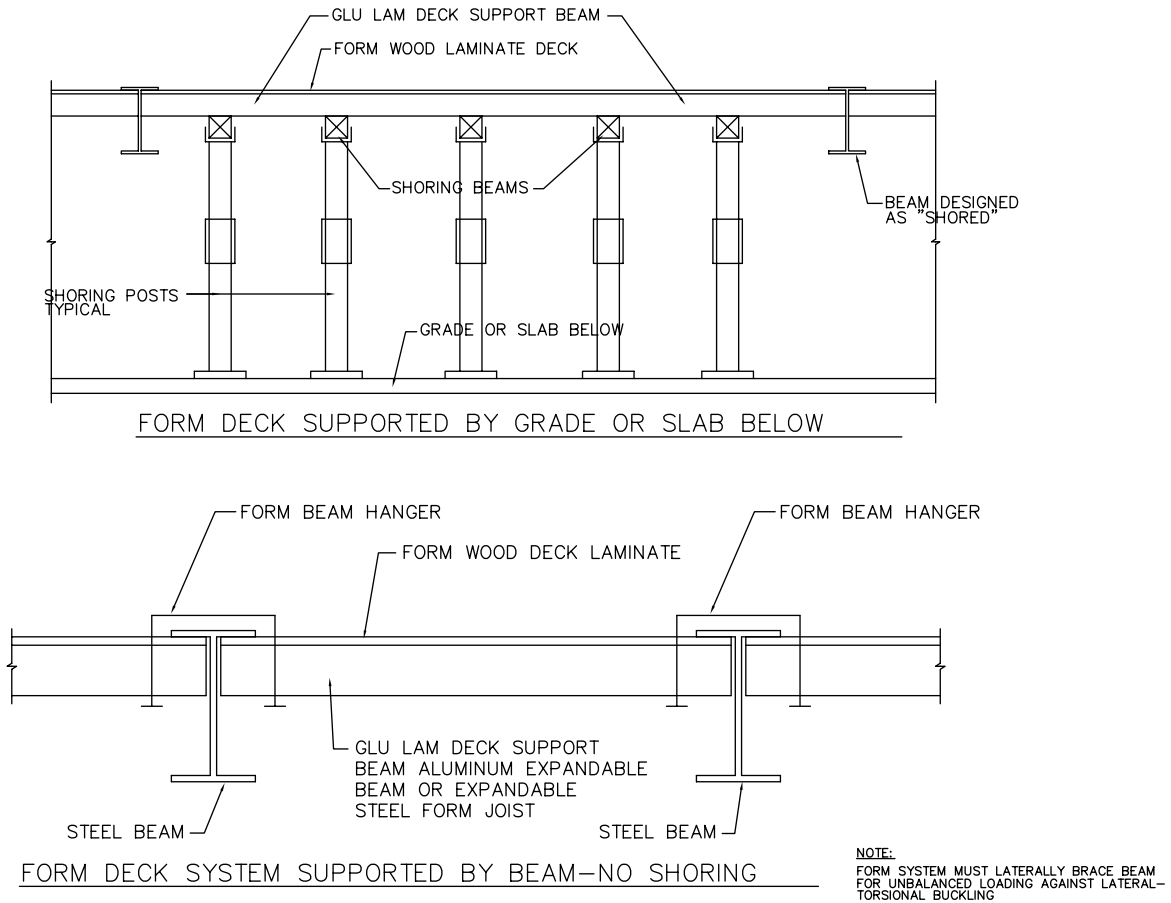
Form Deck System Supported by Beam—No Shoring
